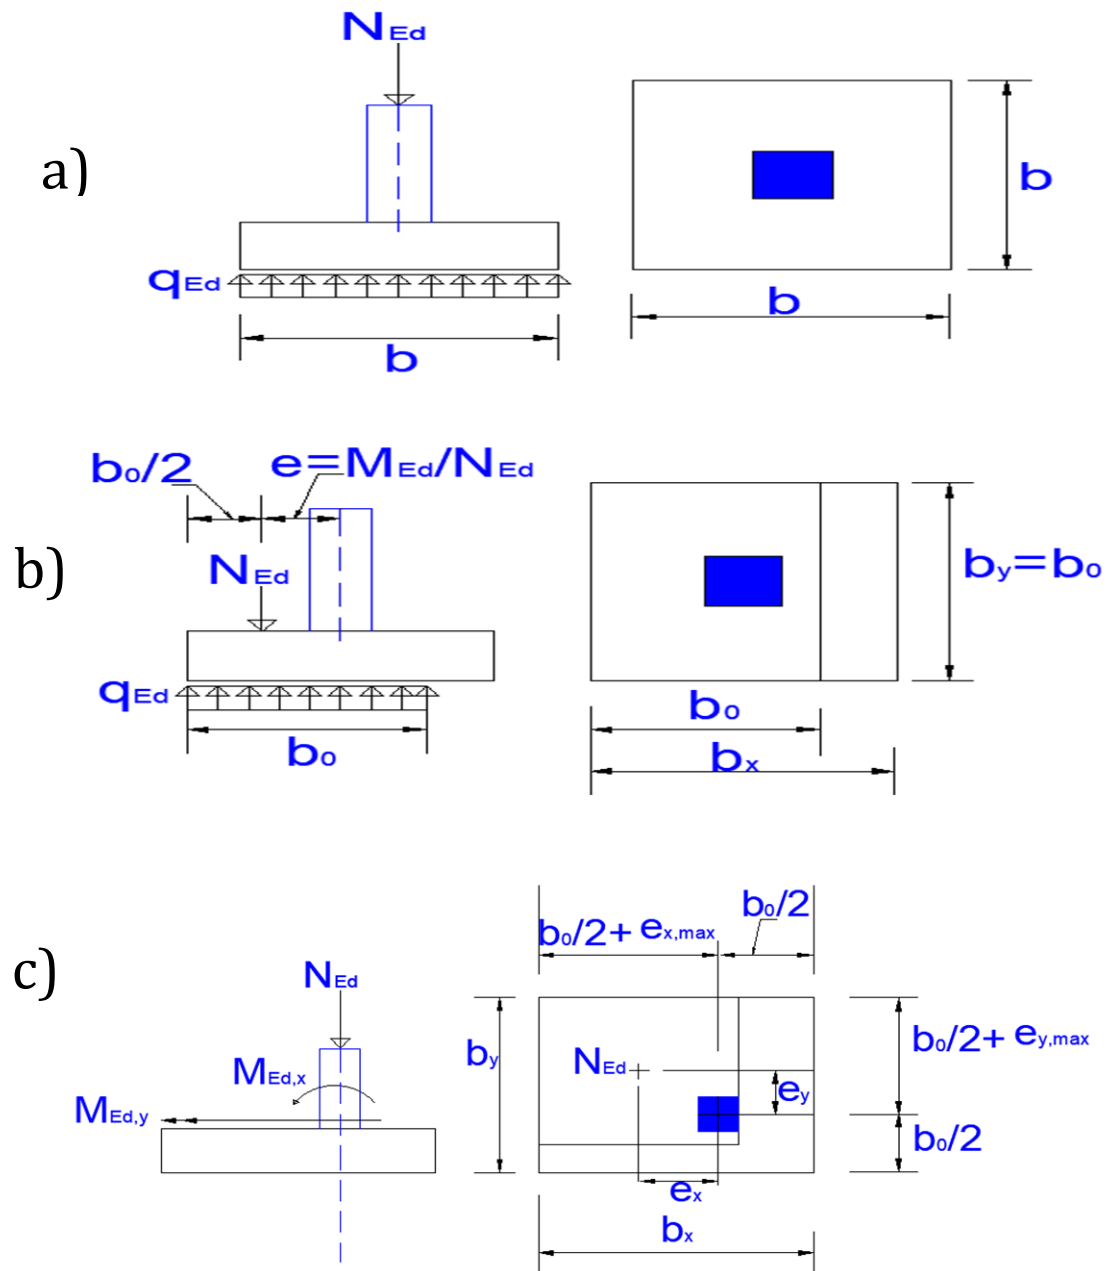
a) column foundation subjected to centric load b) eccentrically loaded column foundation (moment in one direction) c) asymmetric column foundation with moment in two direction [15]
